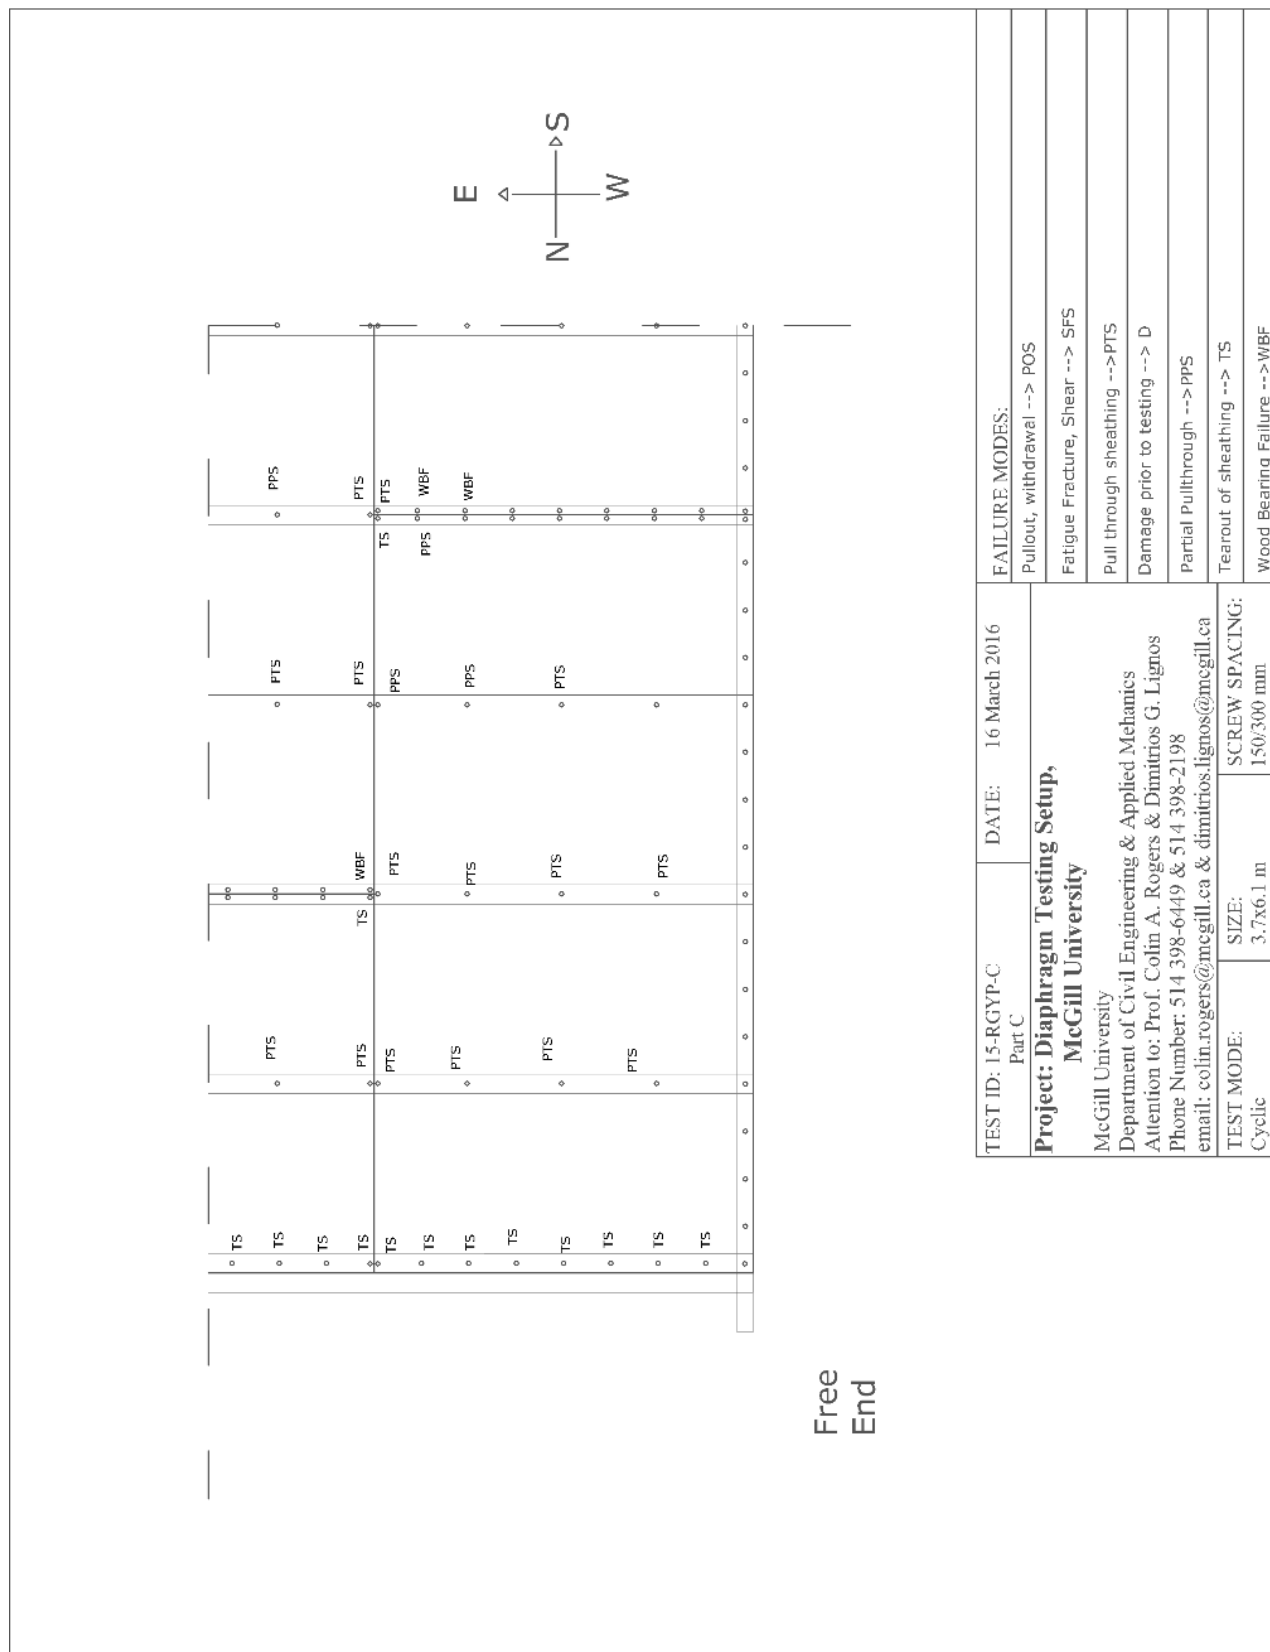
Sheathing Fastener Failure Modes Part B Specimen 15-RGYP-C
